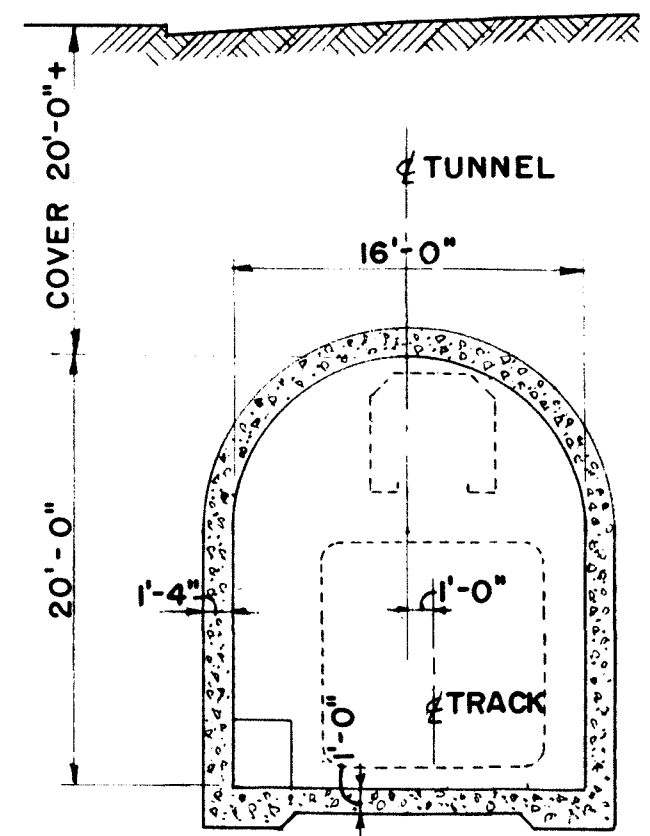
Typical tunnel structures for subsurface operation of rapid transit system.
